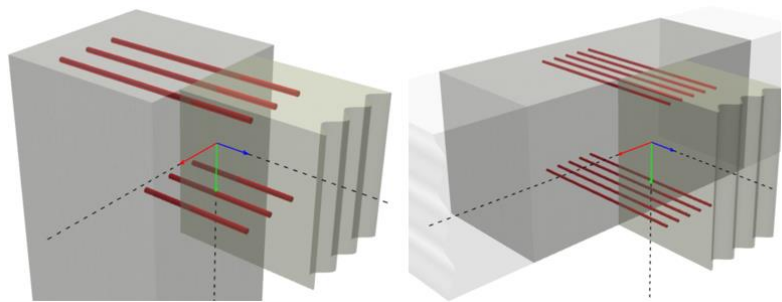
3D representation of beam-to-column and beam-to-beam connections on Hilti Profis Engineering.
